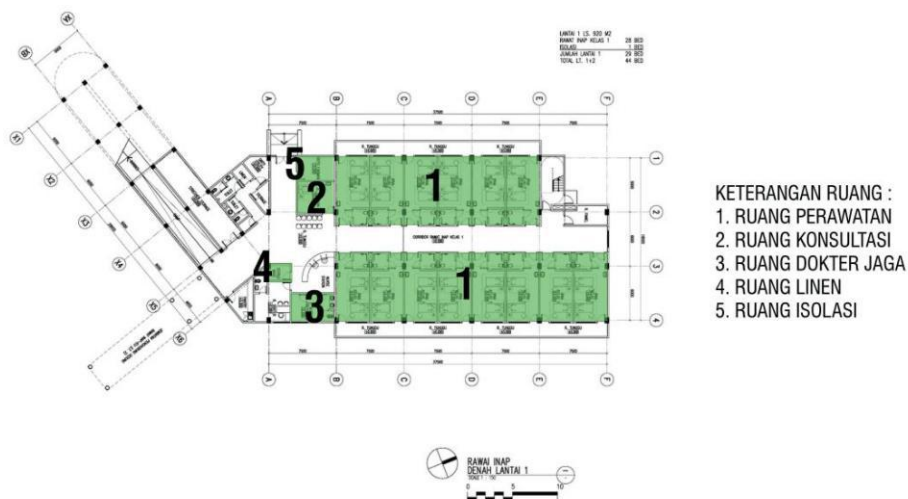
1st Floorplant Inpatients General Hospital RSUD Samboja
